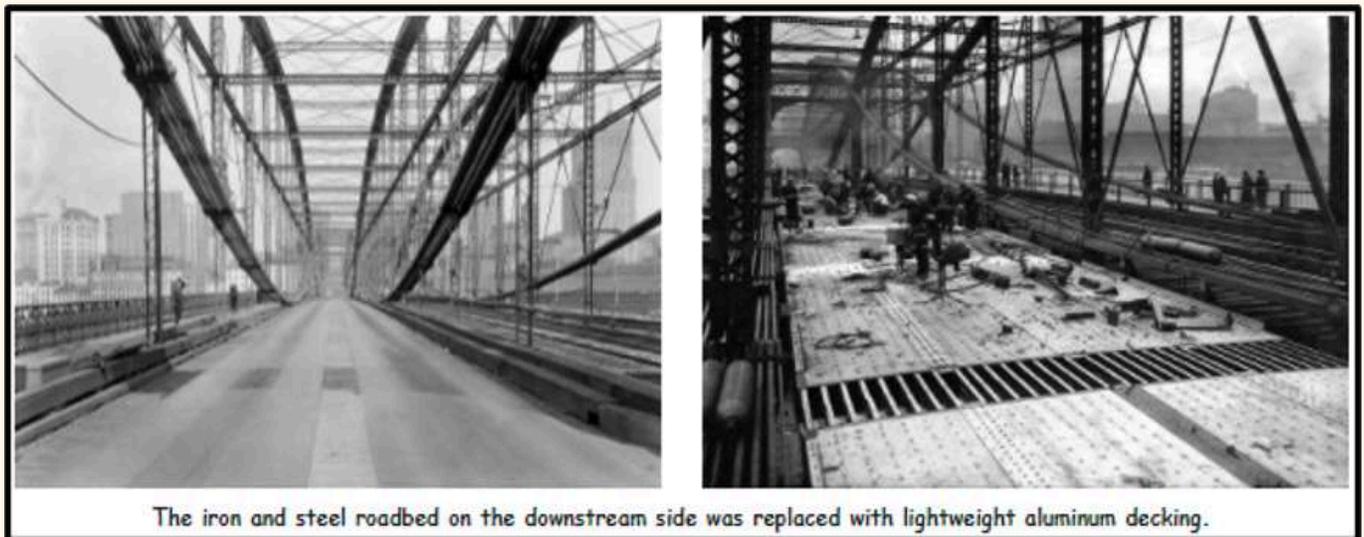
Smithfield Street Bridge decking in 1933. Photo online from Brookline Connection¹
